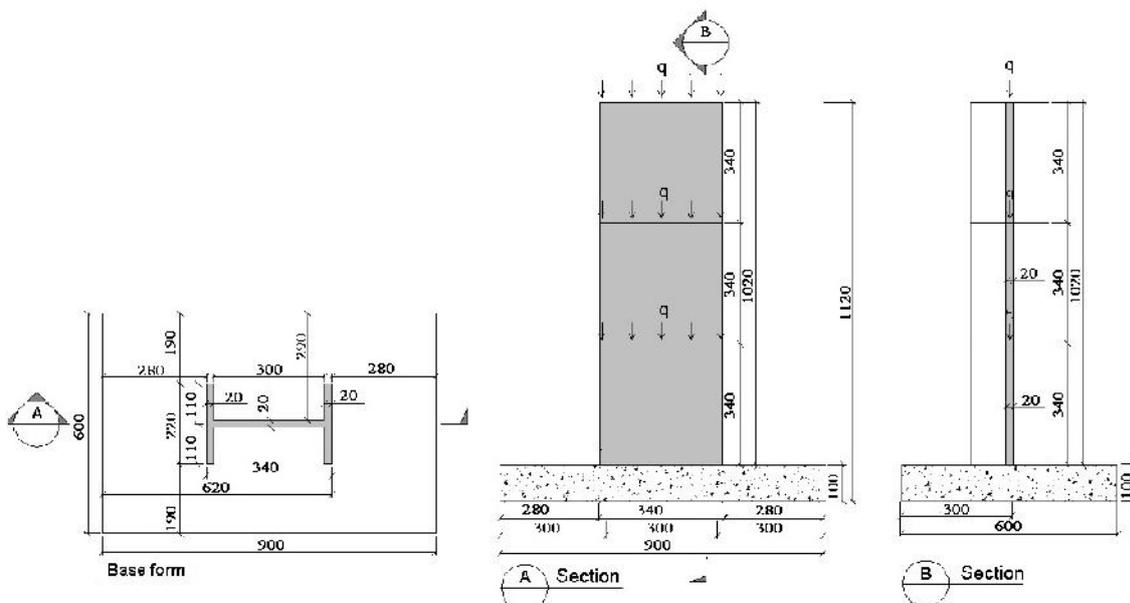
Geometry of slender wall and its foundation (Thorhallsson and Olafsson, 2010),
